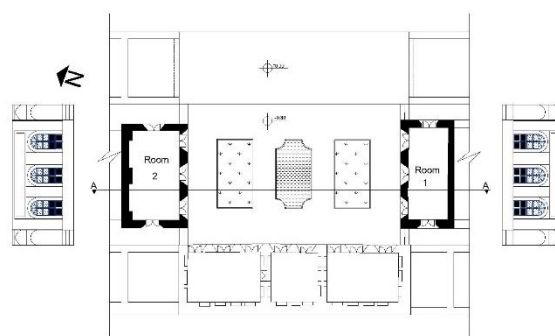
Position of the room one and room two according to the courtyard and their elevations
